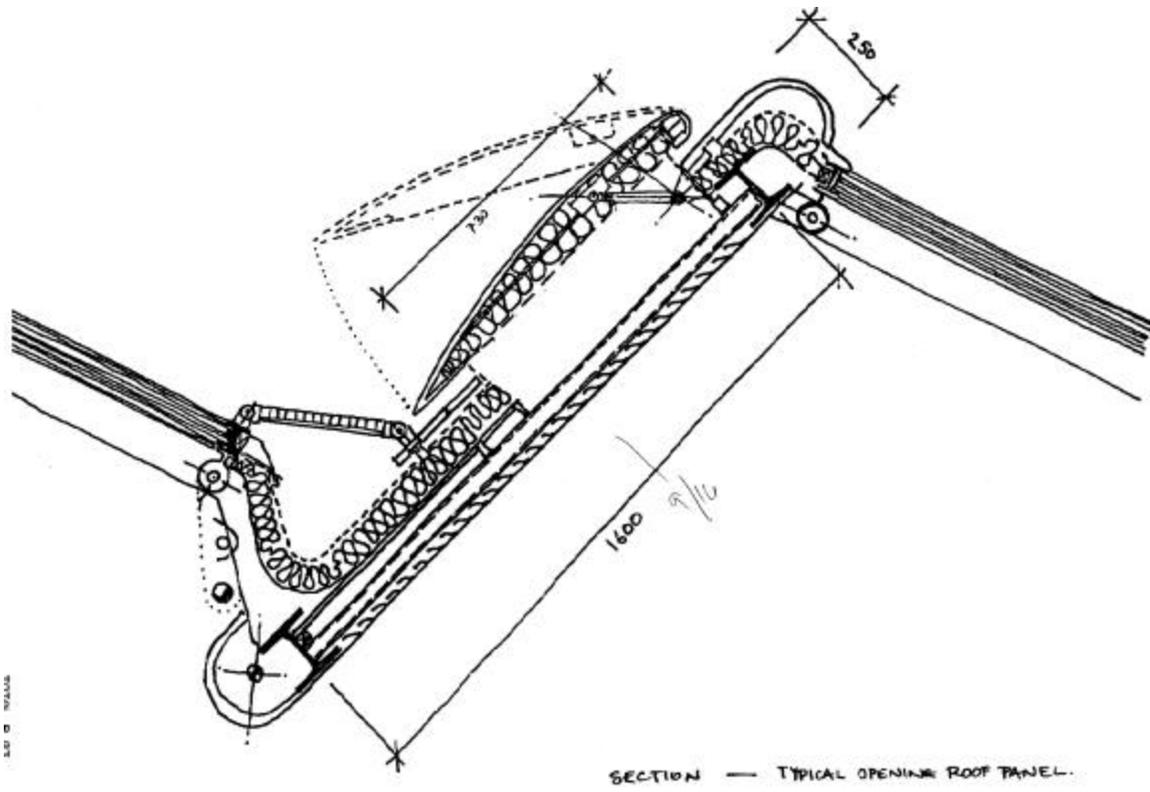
Section Showing Typical Louver Mechanism At Roof of WTC (courtesy of KPFI)
